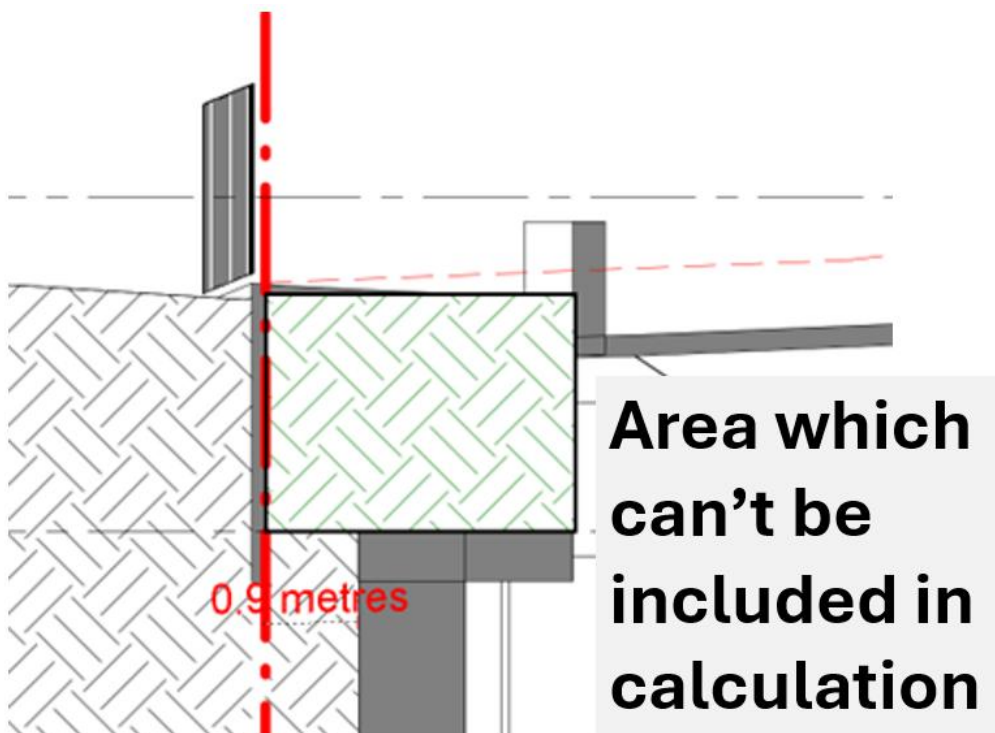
Basement wall 0.9m from southern boundary - cannot be included (Source: Council's Landscape Officer)
